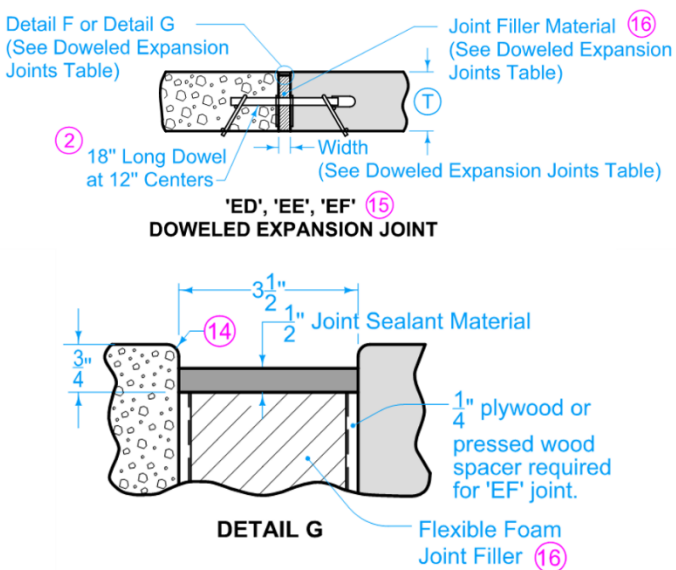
Schematic showing EF joint according to Iowa DOT standards (IowaDOT Standard Road Plans).
